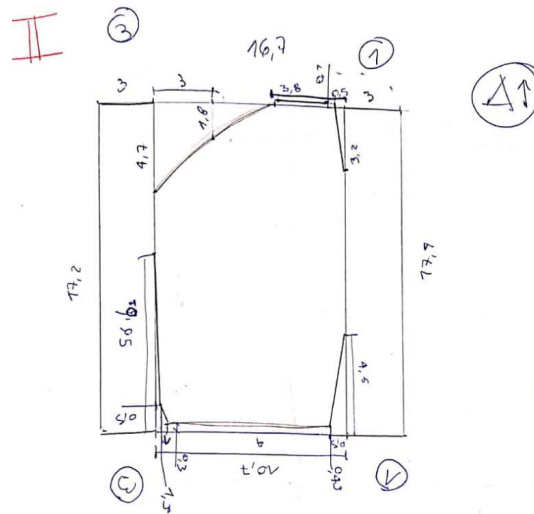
B-I-G-1: example of geometrical survey of the cross-section II.
